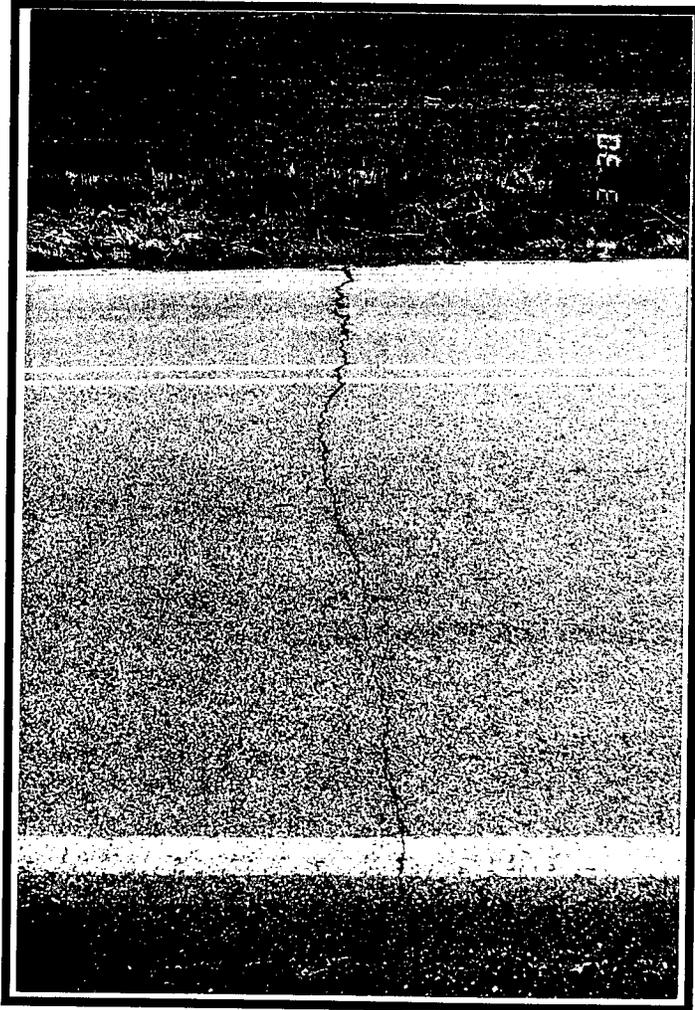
Cracks in rubber-modified asphalt
